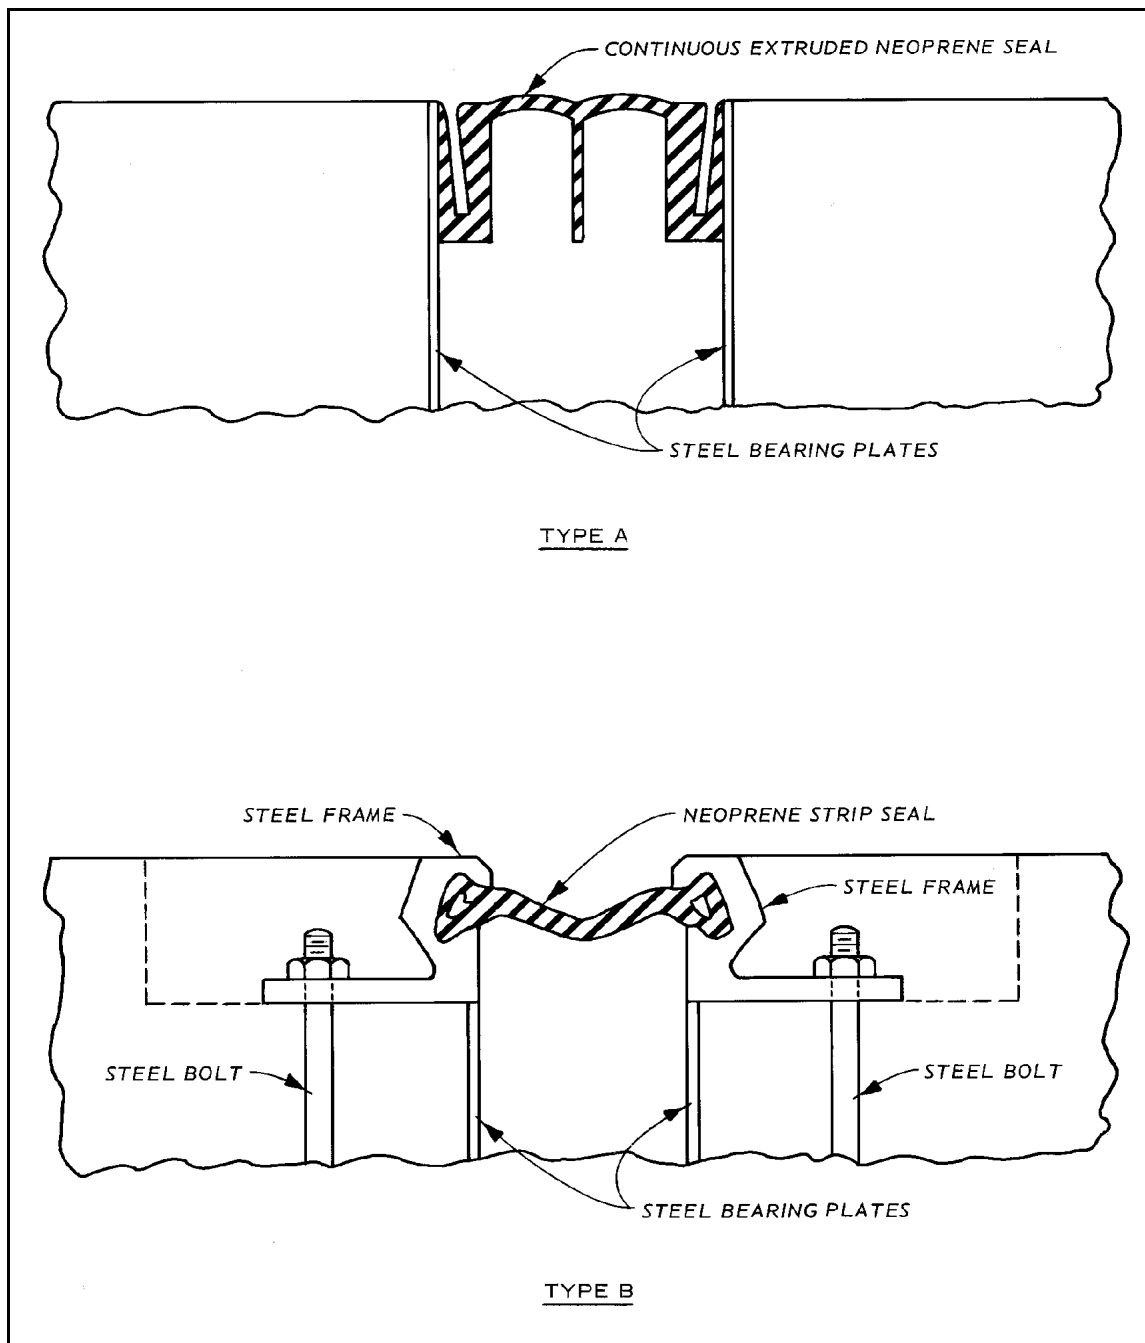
Typical transverse joint seals (Sheet 1 of 3)
